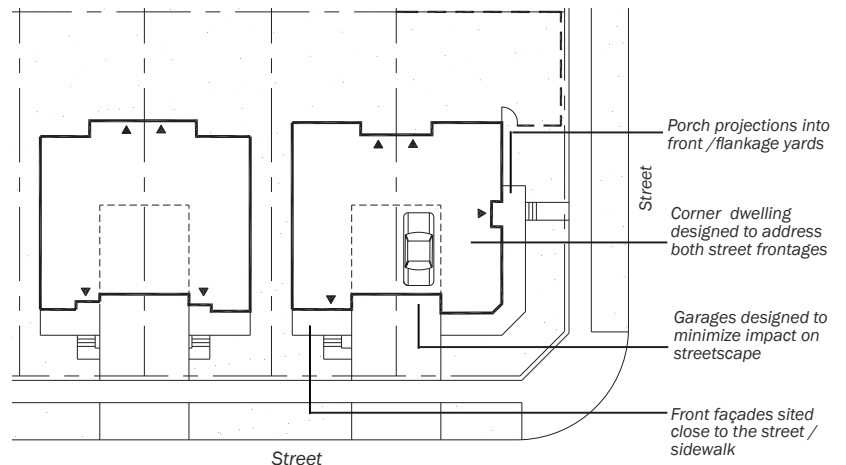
Conceptual plan layout for Semi-Attached Dwellings
